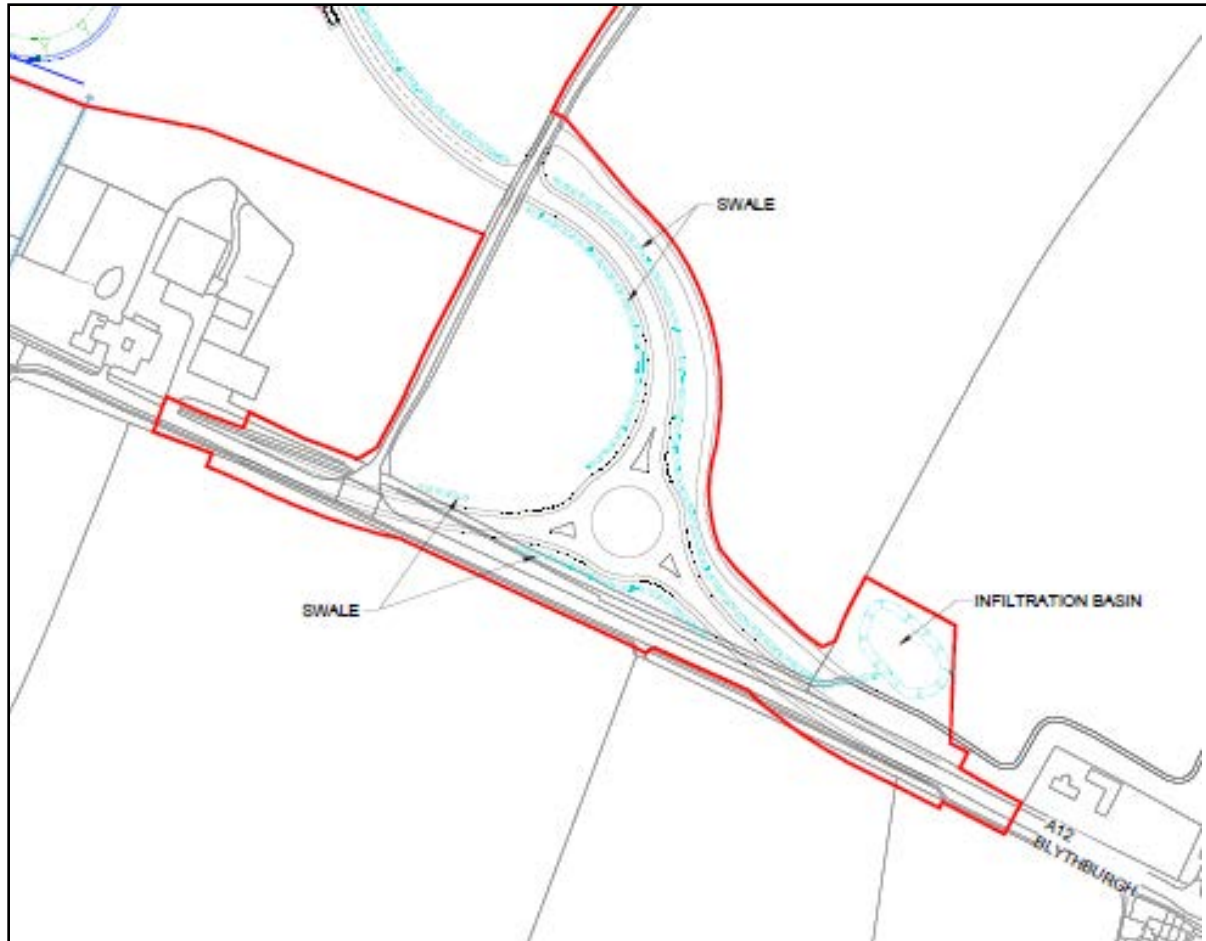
Northern park and ride internal layout showing concept drainage infrastructure to the north
